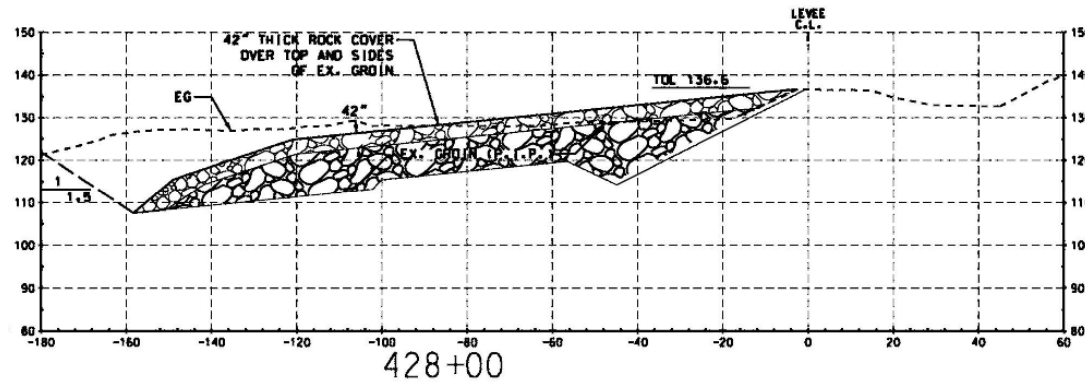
Typical Cross Section of Measure 12, Failure Reach 2
